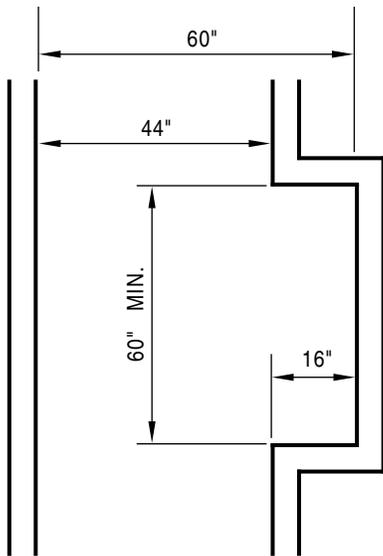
B-27 - RAMPS AND SIDEWALKS
